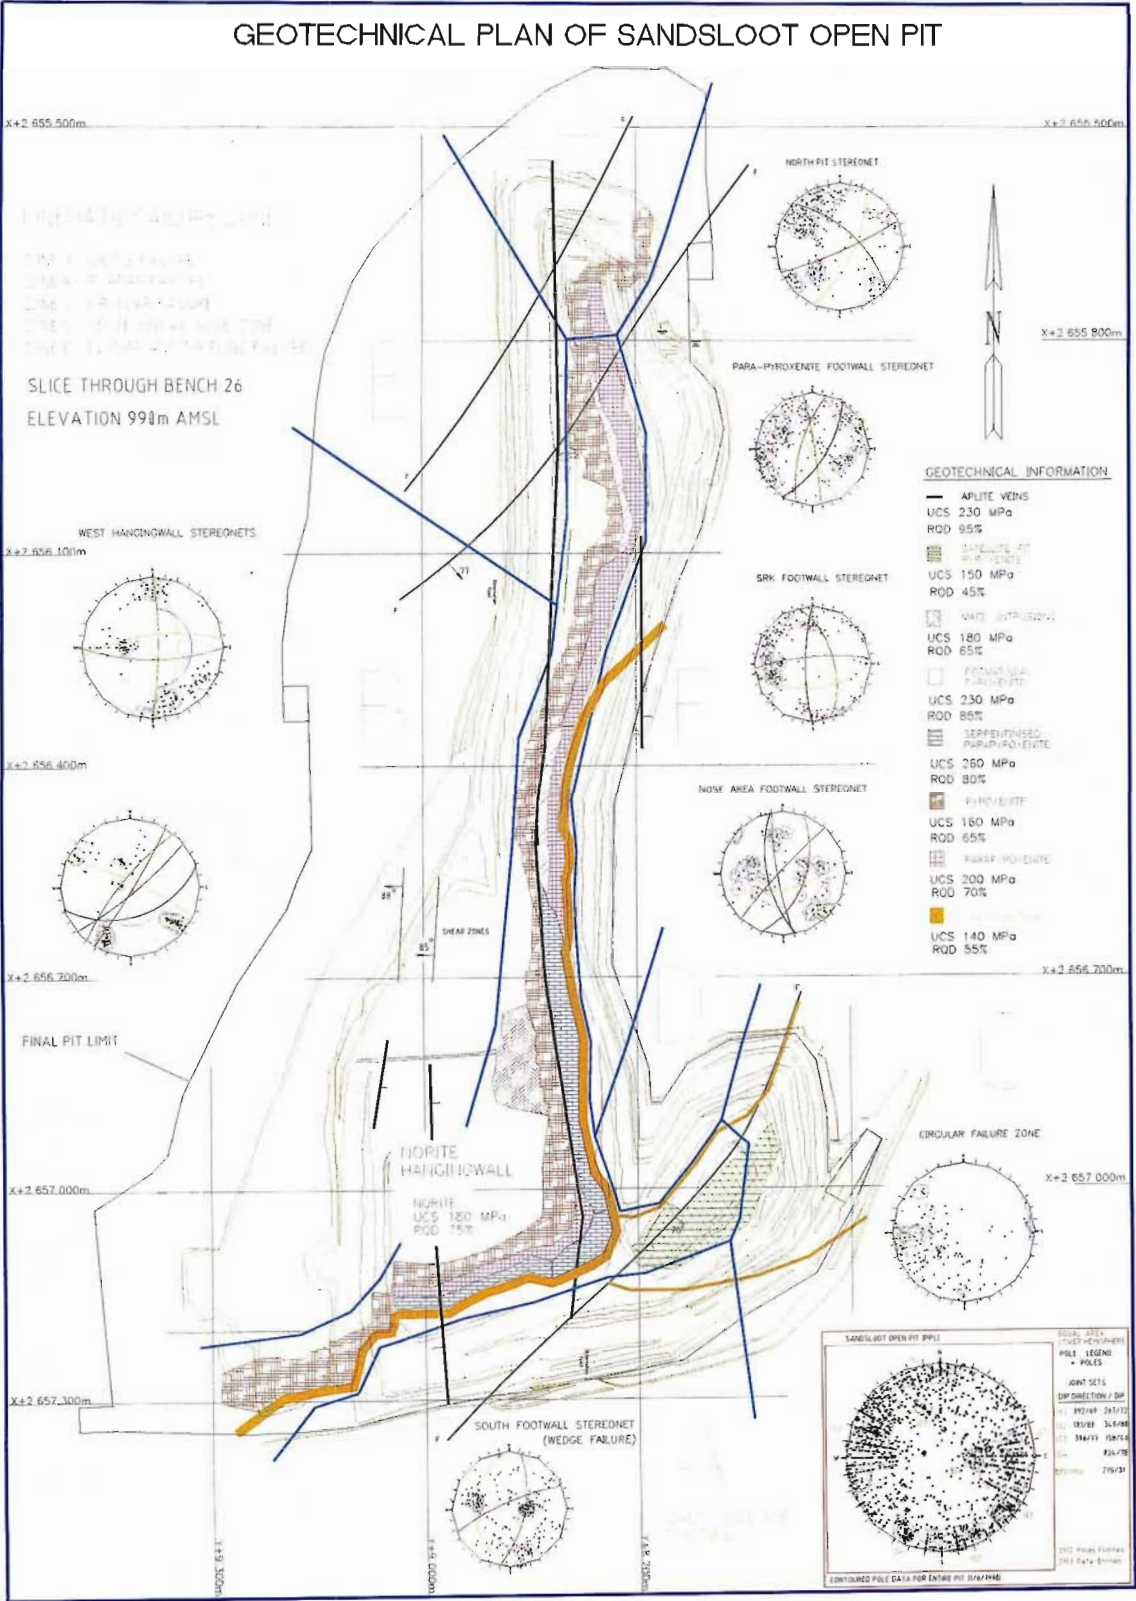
Geotechnical plan of Sandsloot open pit.
